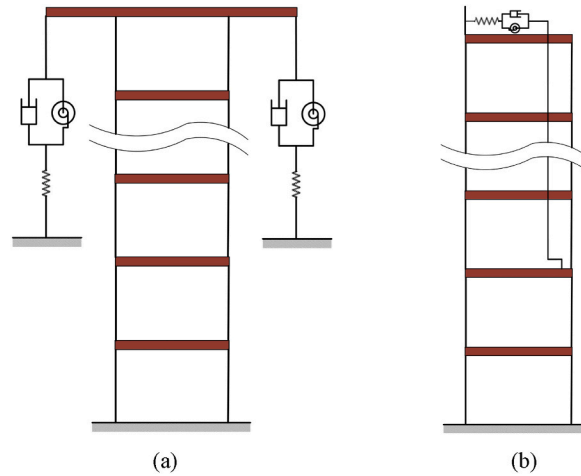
Common connection schemes for inerter systems (a) Outrigger connection scheme; (b) Cross-layer connection scheme.
